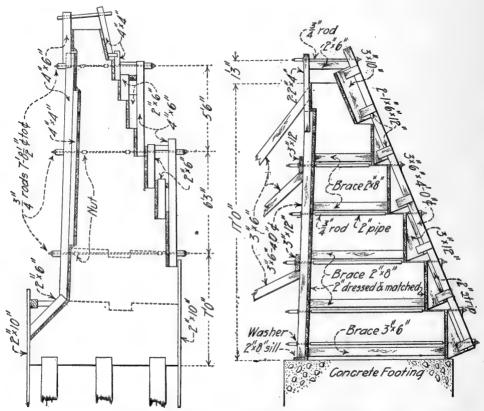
Forms for Illinois Central R. R. Retaining Wall.
